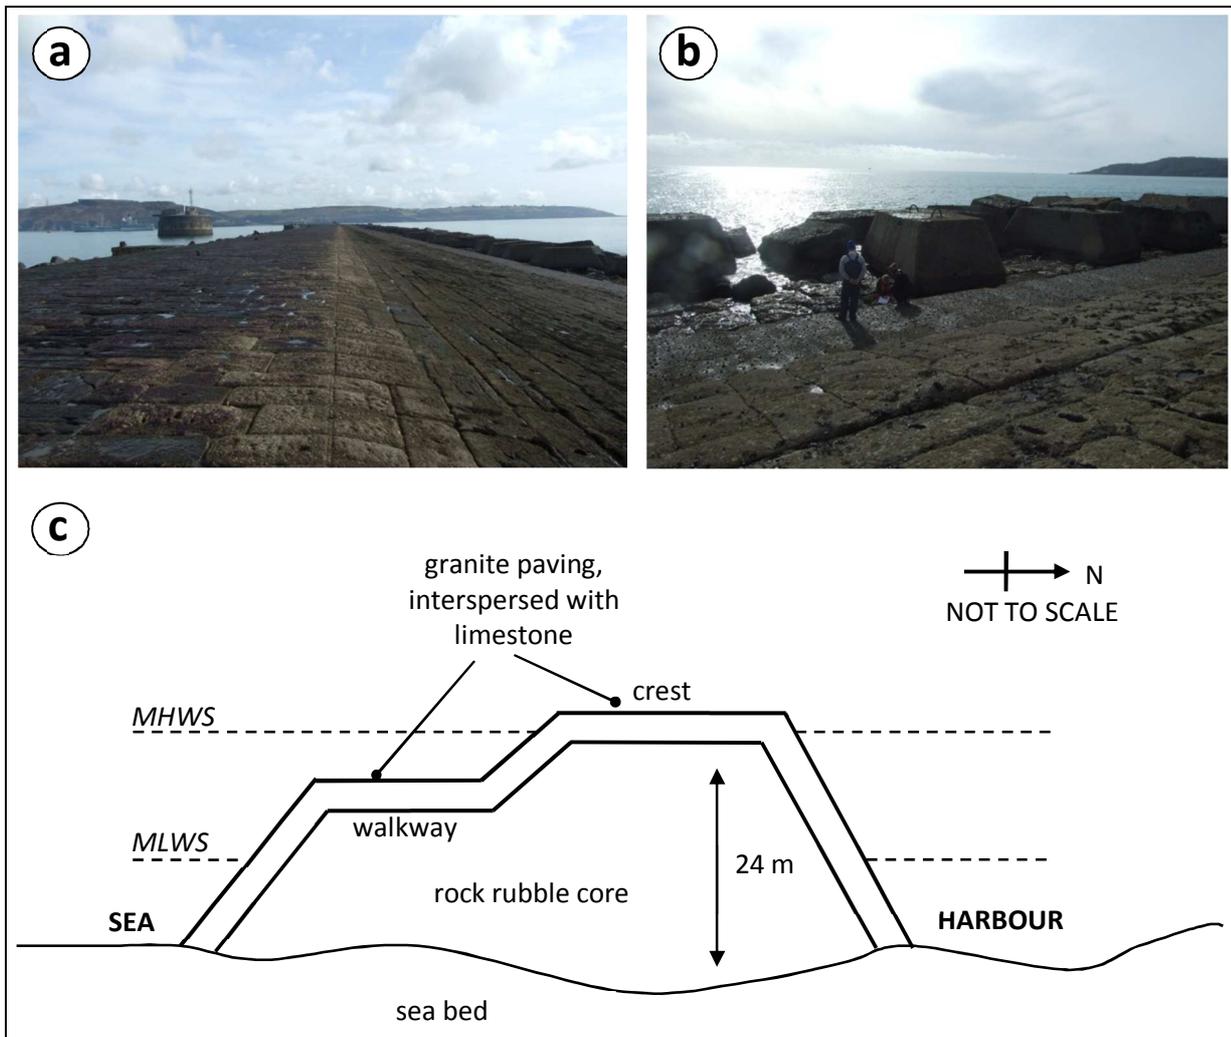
1 Plymouth Breakwater: (a) looking east along the upper crest and (b) looking south towards the lower walkway and concrete wave breakers (people for scale), and (c) cross-section sketch of the breakwater (not to scale).
